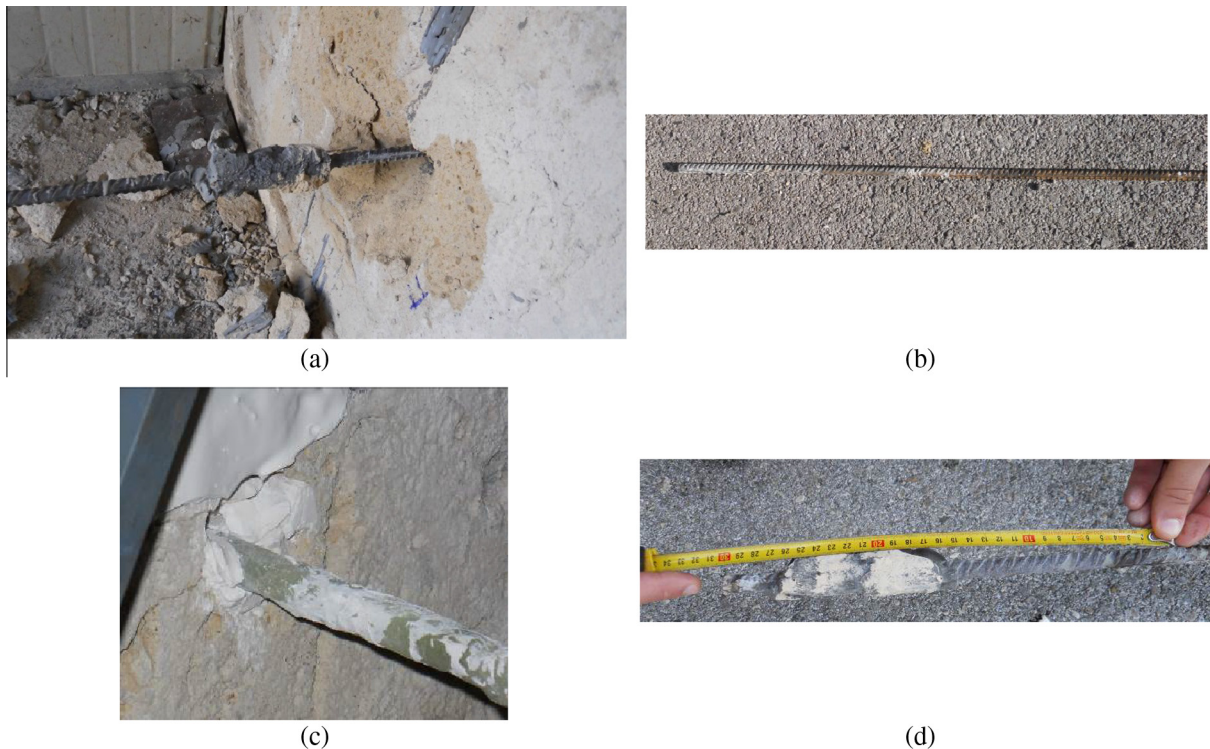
Typical failure modes observed in series 1: a) Masonry Cone Detachment (MCD) for steel bar embedded in C-based grout; b) complete slippage of the steel bar embedded in the P-based grout after the test (B/G failure); c) Bar/Grout (B/G) interface failure for the GFRP bar embedded in the P-based grout; d) bonded length of 150 mm for bar SC_3 relieved after the pull-out test.
